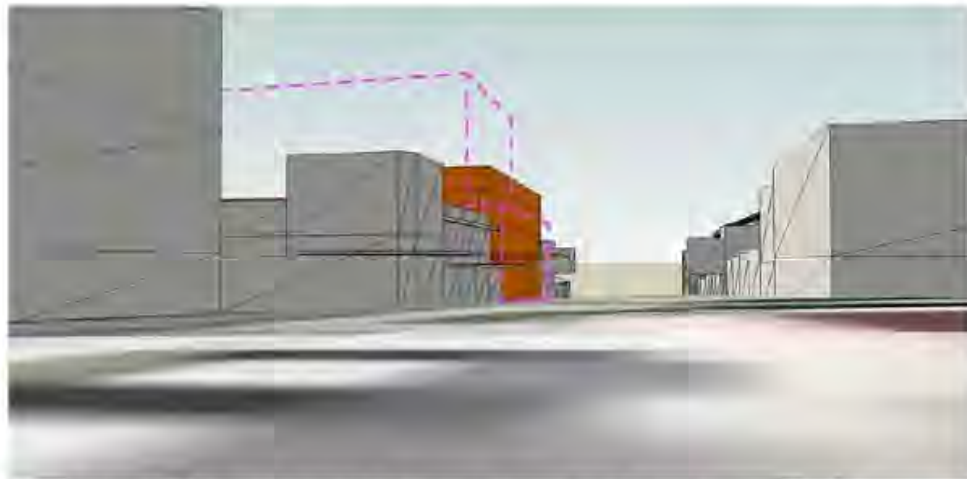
existing built form with proposed building envelope comparison (Norton Street looking north).
